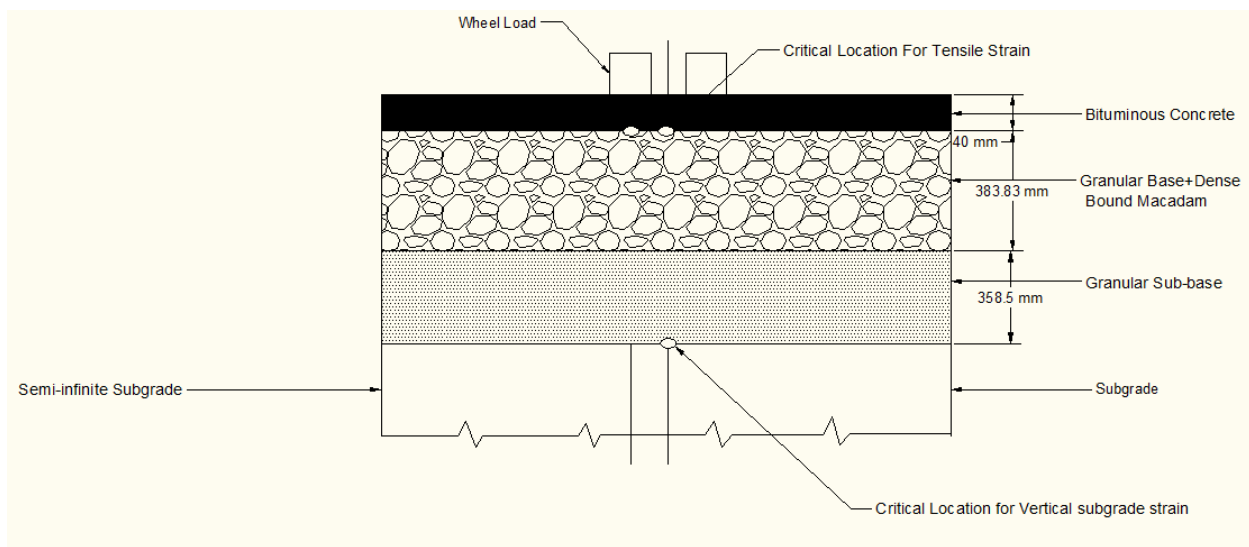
Cross-section of Flexible Pavement after Flooding:
